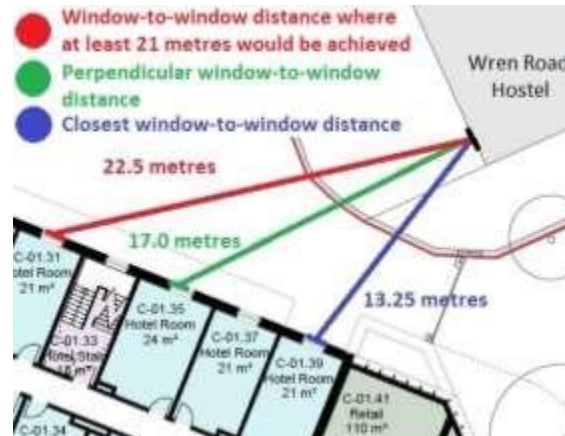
Proposed first floor plan, showing the various distances to the hotel from the most sensitive habitable room window at the Wren Road Hostel.
